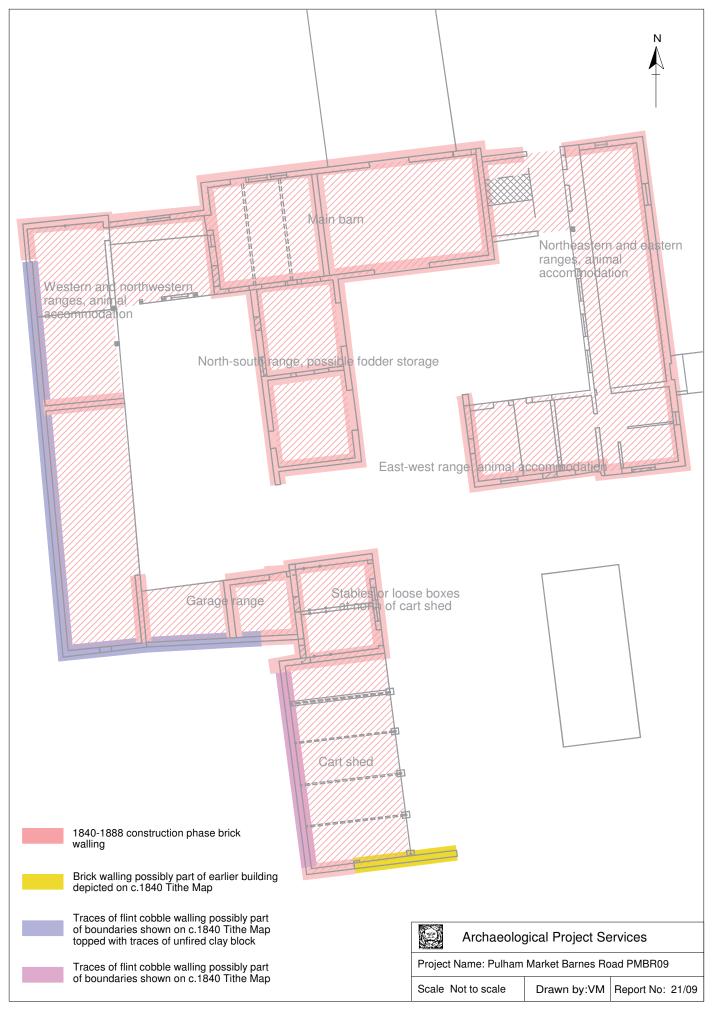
Generalised plan of surveyed buildings with possible 19th century layout discussed in text
